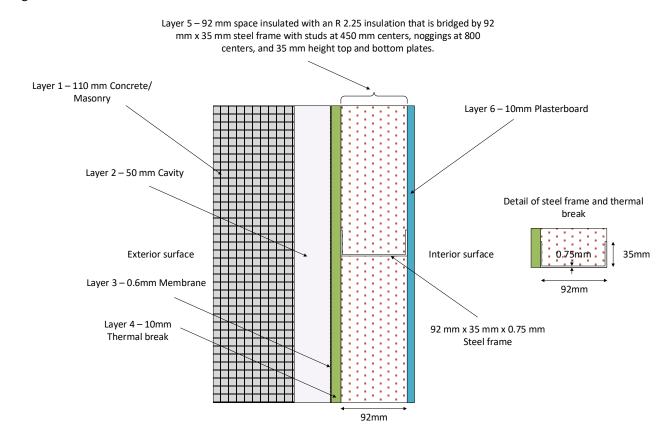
WALL BUILD UP FOR BRICK VENEER STEEL FRAME
